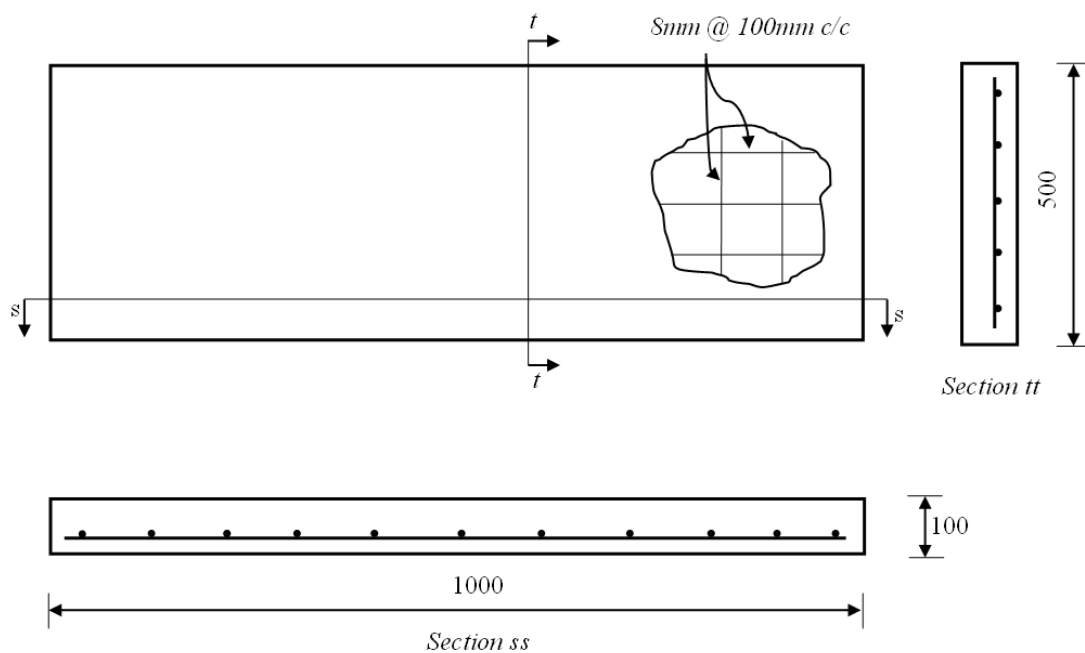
Geometric details of solid concrete panel (All dimensions are in mm)
